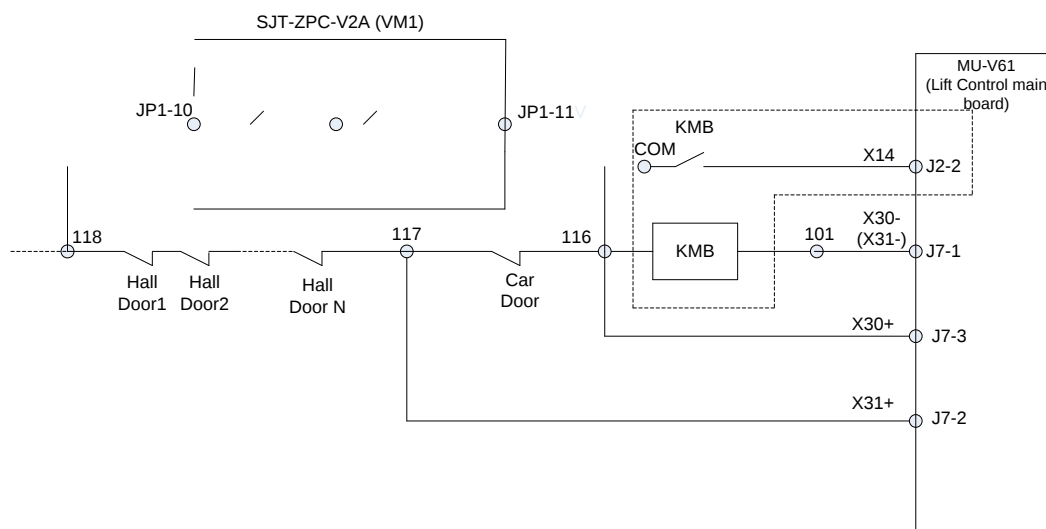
Advance door open & re-leveling & UCMP test & Door short detection control when single door (suit for gearless and geared machine)
